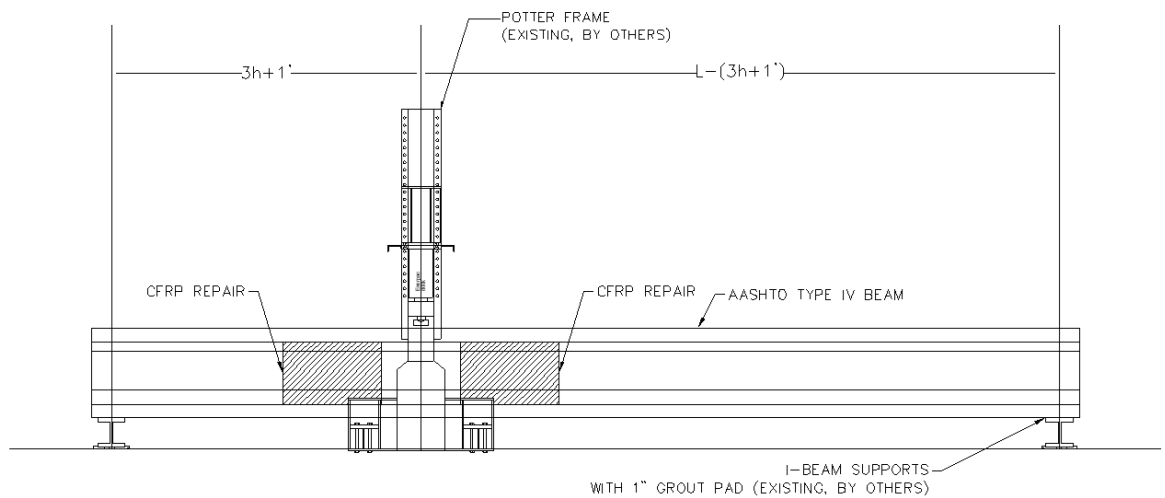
Full-scale shear load test of the AASHTO IV beam repaired with externally bonded CFRP - Test Location 2
